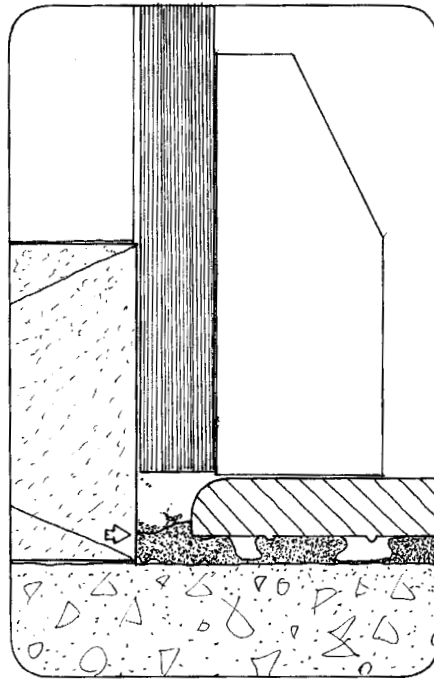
How not to allow for movement of floor tiling #17: Allow joint grout to penetrate and solidify within 10 mm high gaps below 10 mm and thicker plasterboard wall lining. (Collect all 25 cards in the series and qualify for a 12 mm notched trowel autographed by Dr Pingo Dripstone.)
